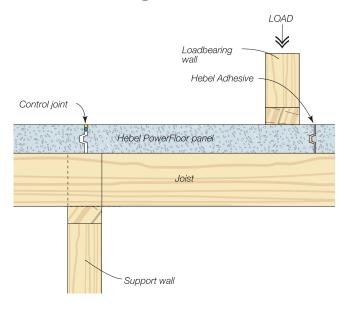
Recommended Control Joint Location for change in Joist Orientation
